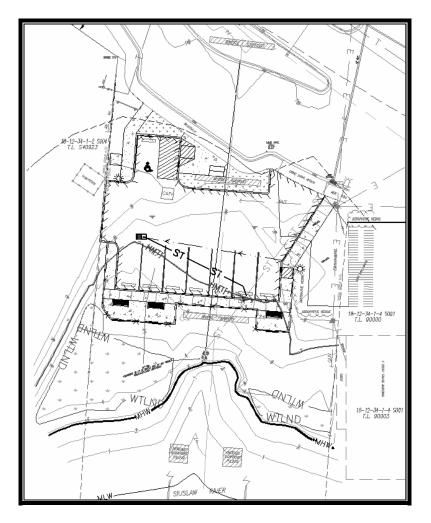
Proposed Siuslaw Interpretive Site & Wayside West
